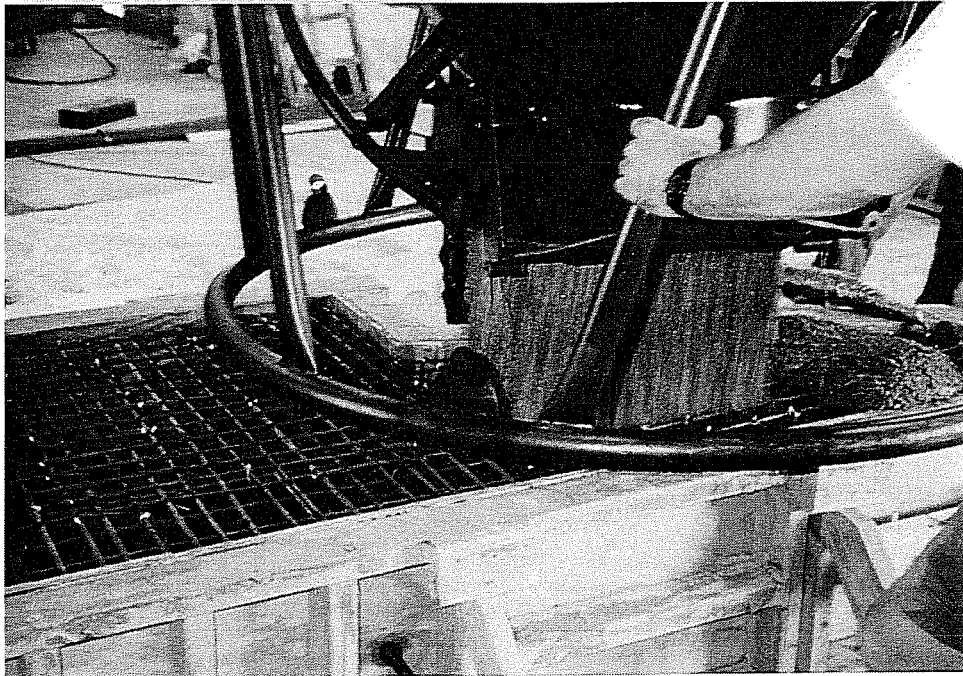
Casting of Specimen CO-PU-54S-TH
